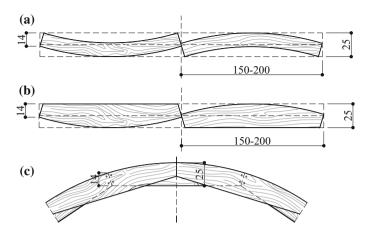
Rules of constructing arches from arch centres [13]: a, b methods of cutting out arch centres from straight planks, c connecting method process of arch centres into a scaffolding bar. The dimensions are specified in [cm]
